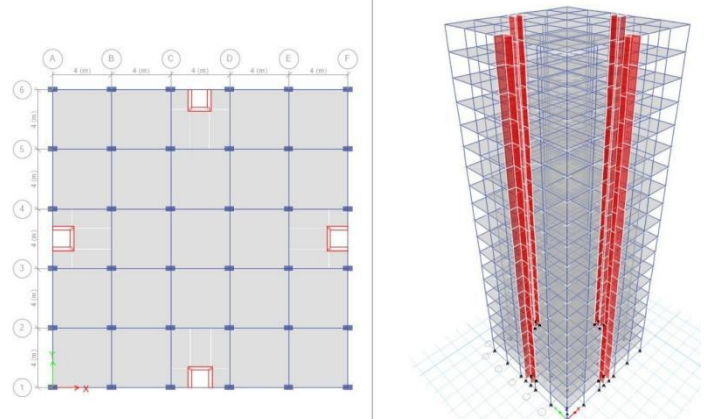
Diaphragm having openings at the periphery with re-entrant corners having shear walls
